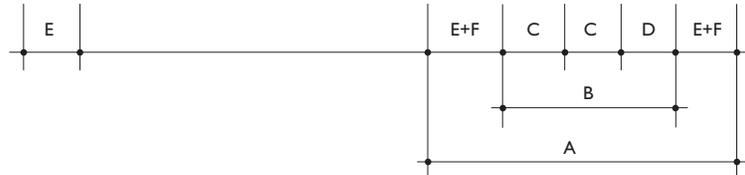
Typical 50-foot Right-of-Way Park Street section
